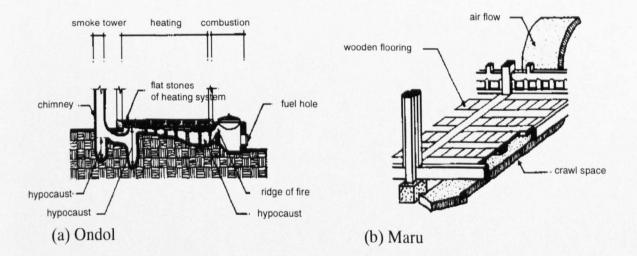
Sections of heating system 'Ondol' and ventilating system 'Maru system'
